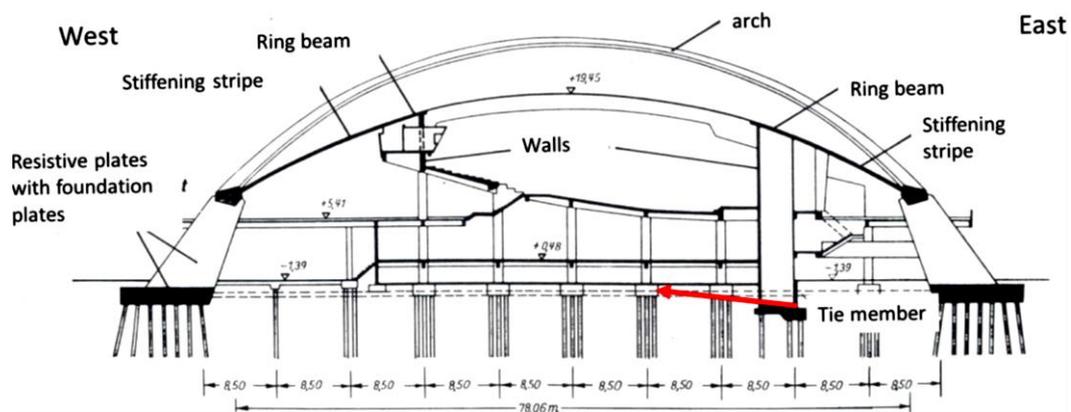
East–west section of the original Berlin Congress Hall (ID-19) (Helmerich and Zunkel, 2014).
